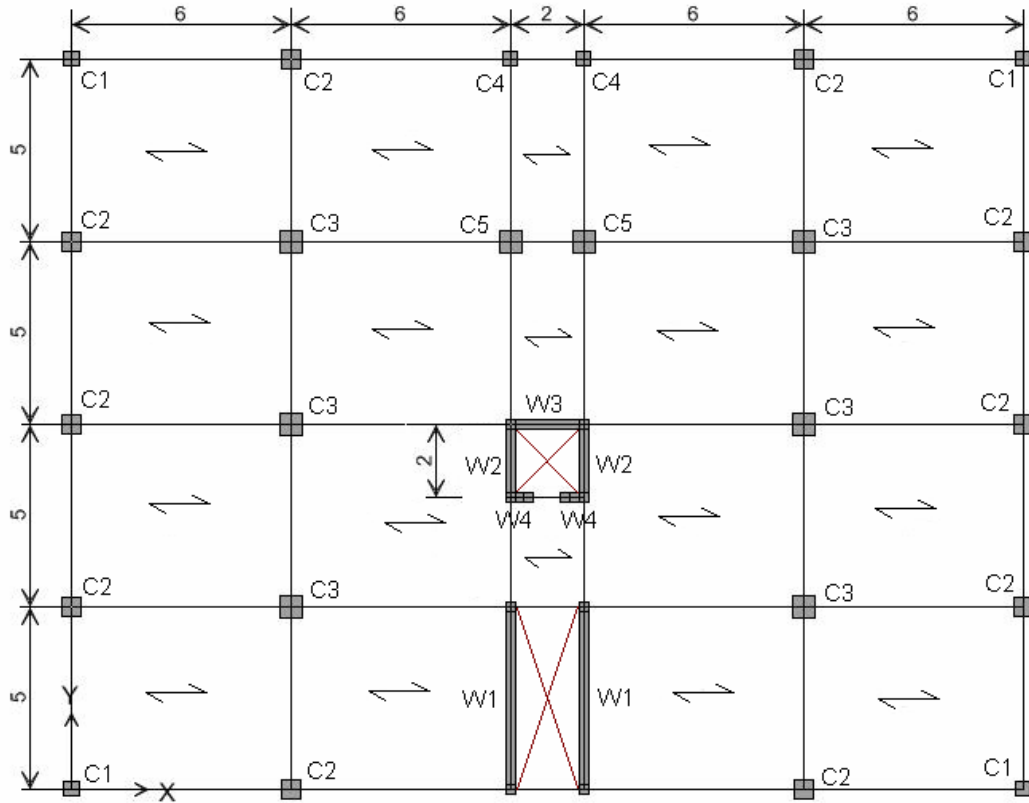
Plan layout for Model # 3 (F5RC)
